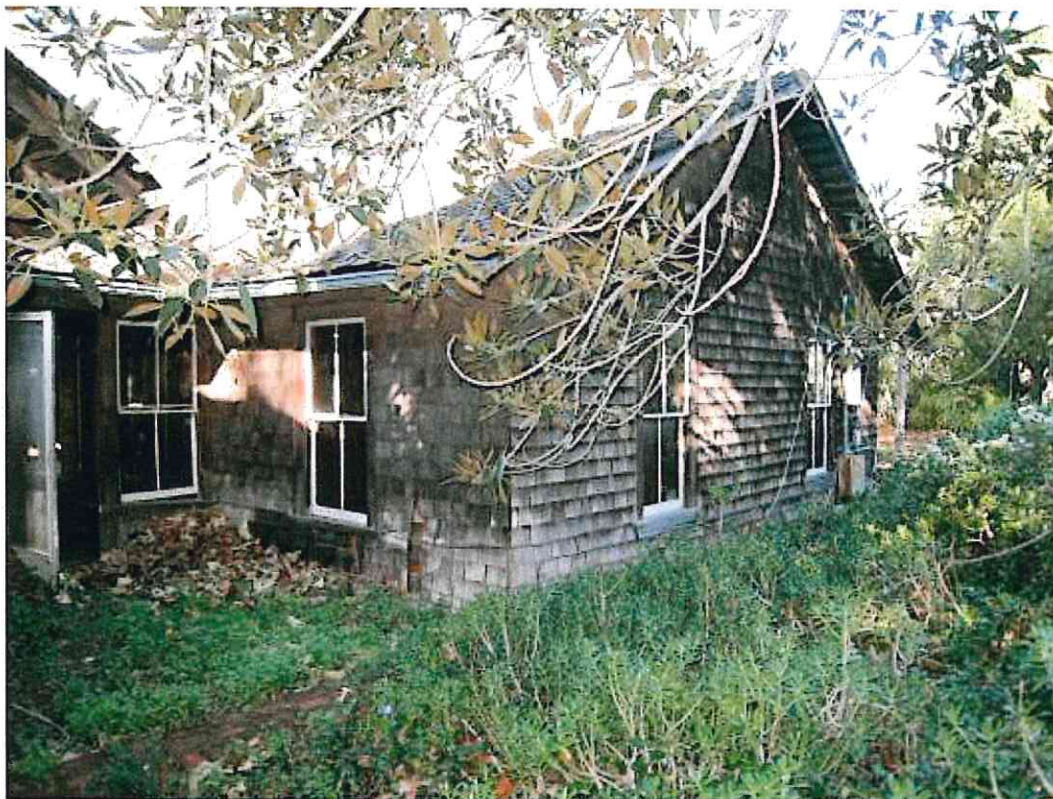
Detail of east and south elevations of 1870s shingled addition. Wall will be extended east and a third 2/2 pane window added on east elevation. Facing northwest. April 2010. A. C. Cole
